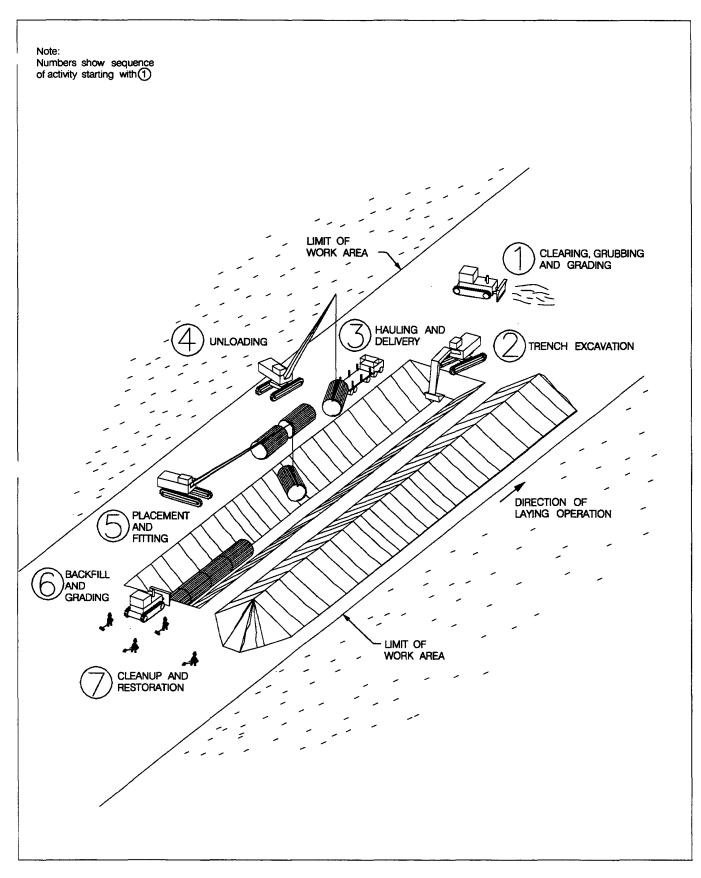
Schematic Drawing of Typical Pipeline Construction Procedures
